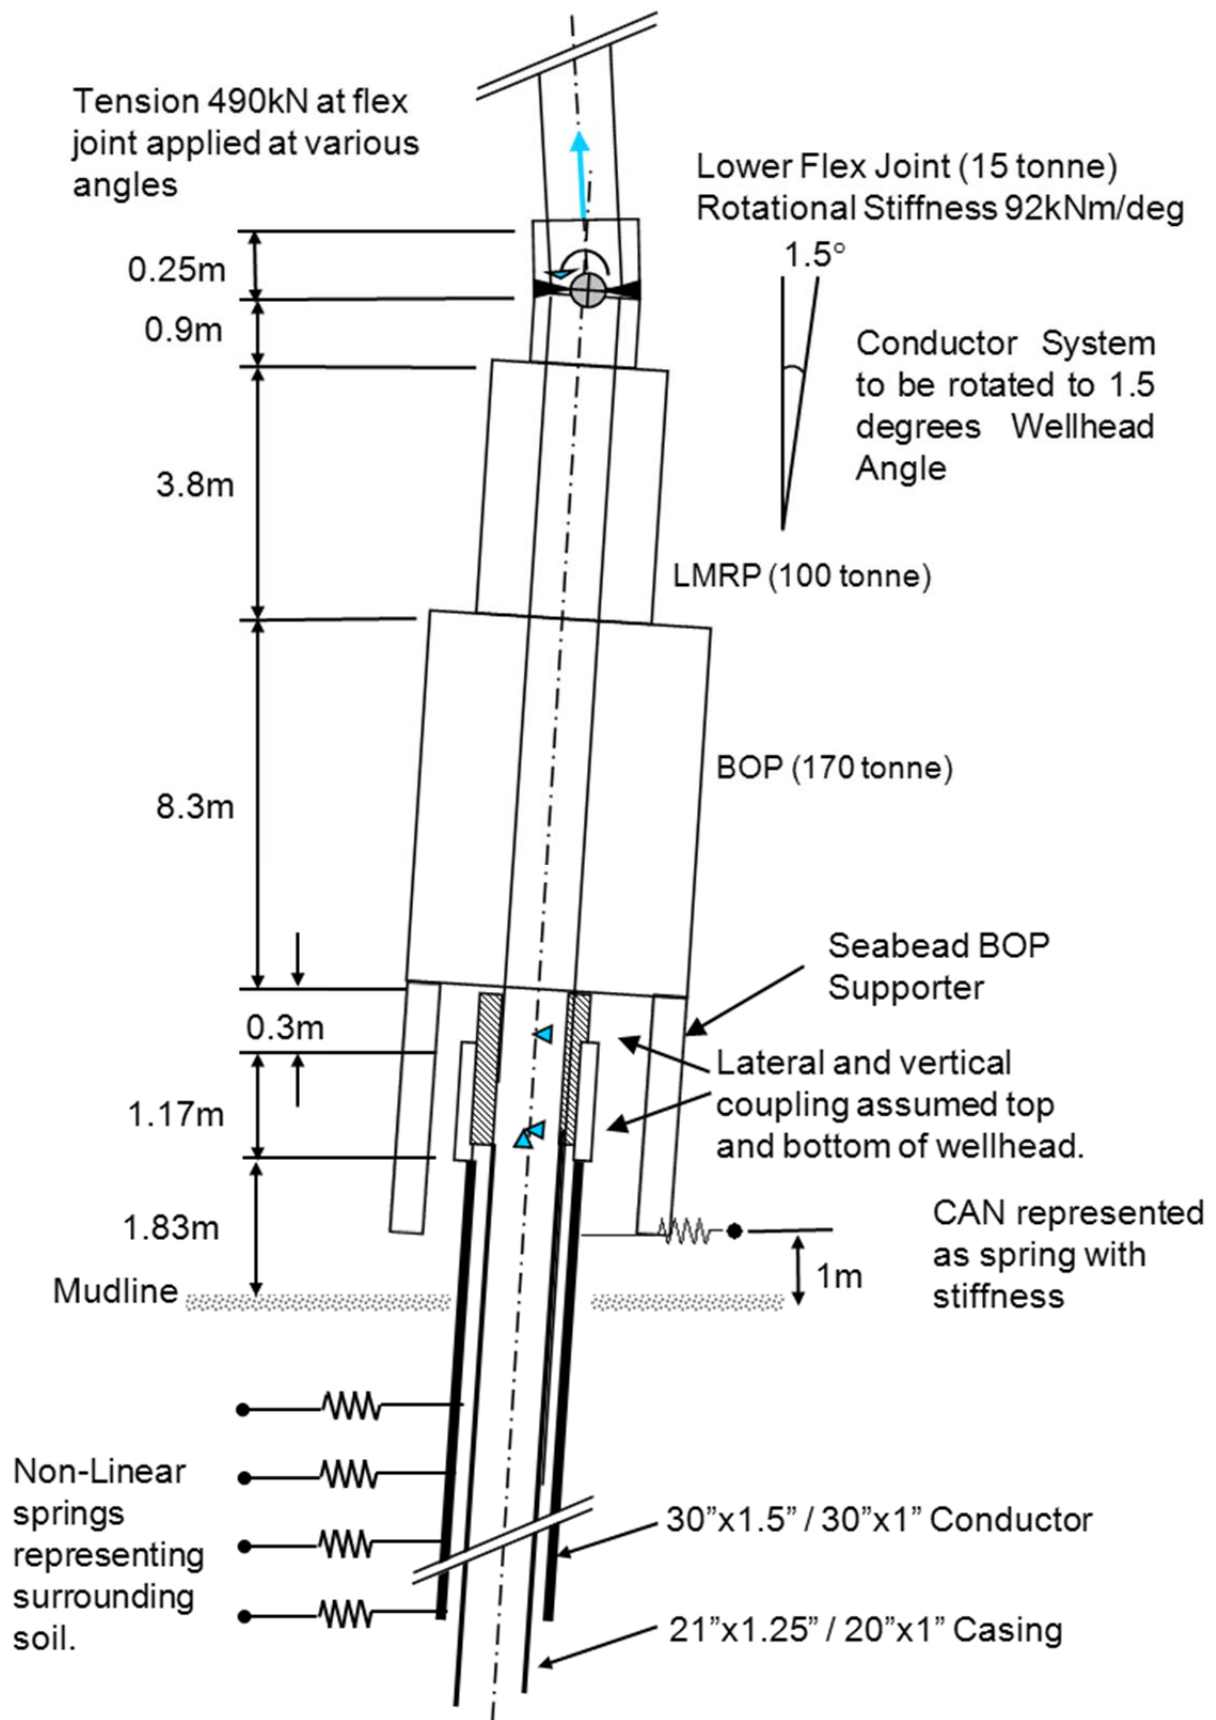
Load Case 3: Wellhead, Conductor and Sub-Sea Equipment Stack-Up supported in a CAN Foundation along with a Seabed BOP Supporter.
